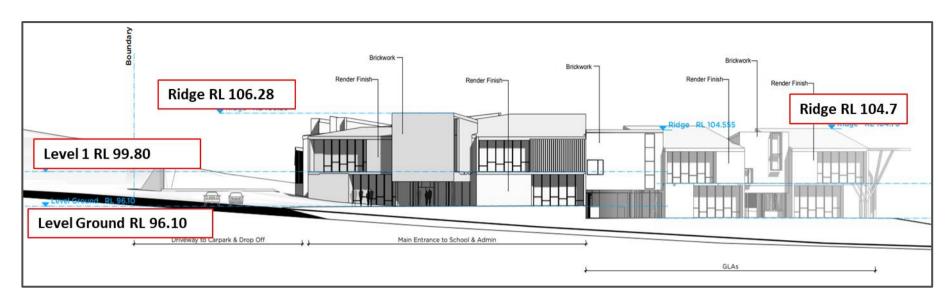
| Northern elevation fronting Kosovich Place (Source: Applicant's EIS 2018)
